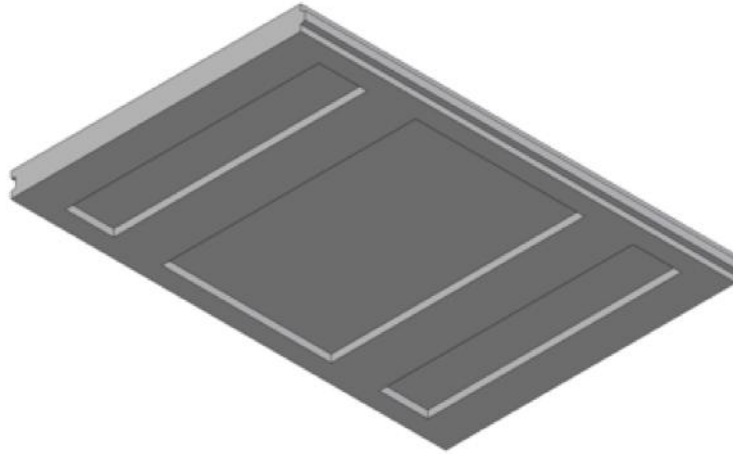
Perspective of the PPCP Test Panels showing under slab grout voids
